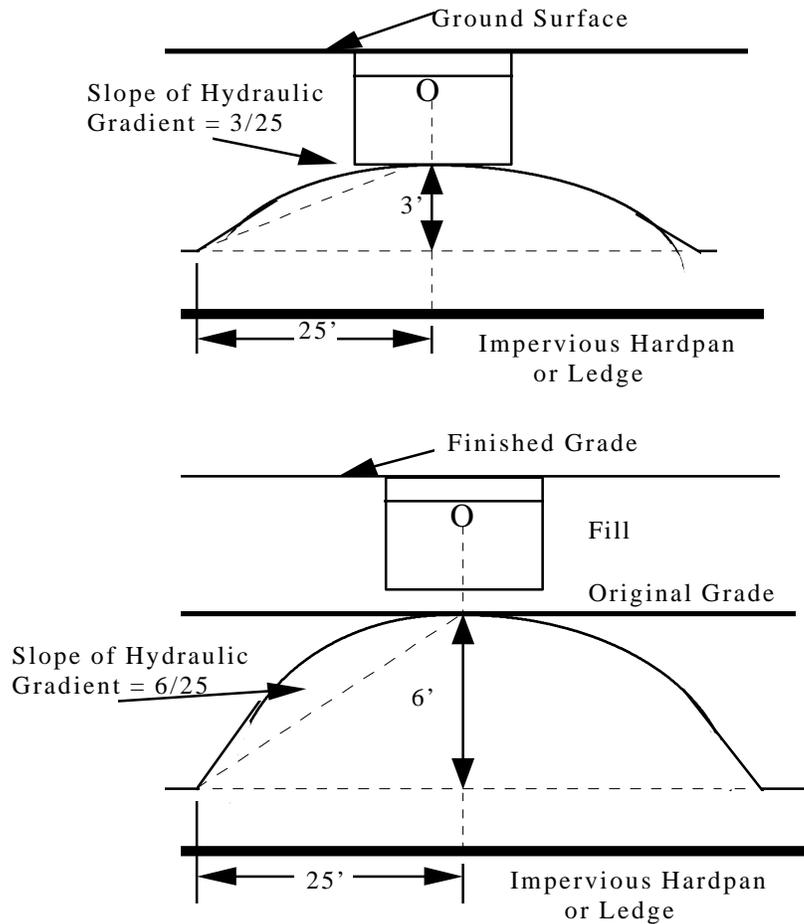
Elevating Trenches to Increase Hydraulic Gradient
